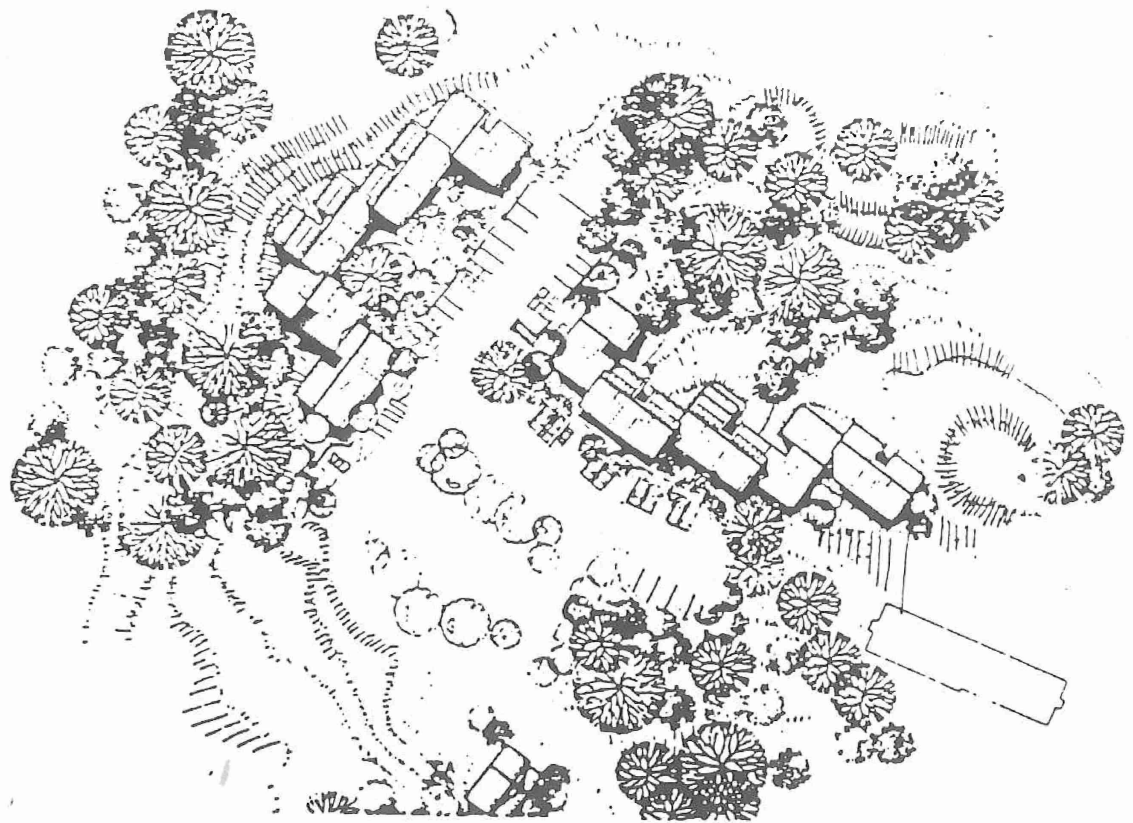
Site/Parcel Plan (SPP) Level of Detail (*ibid.* p.1-20)
